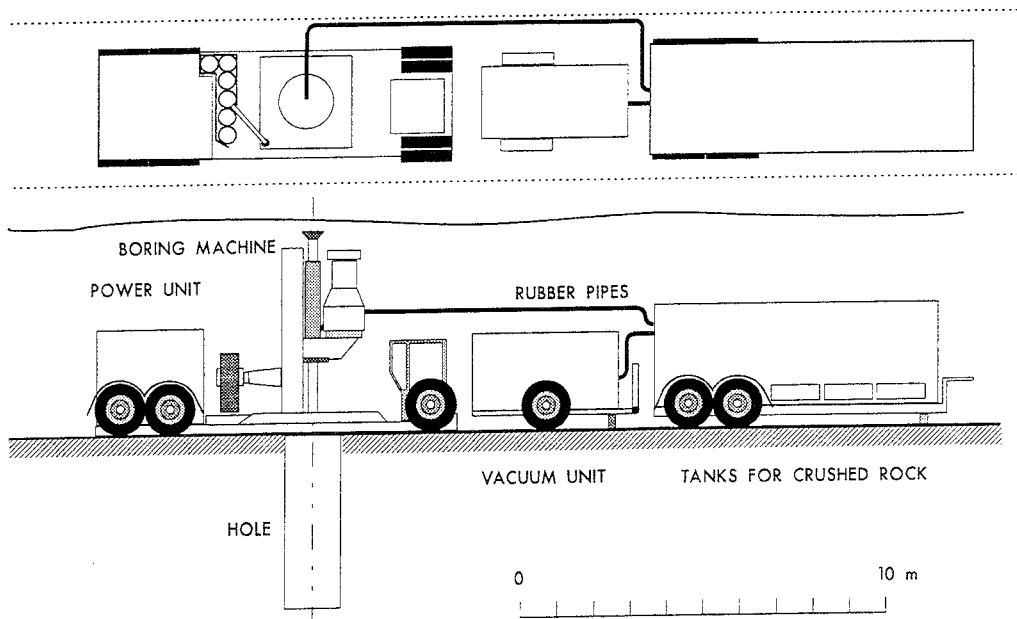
One proposed concept for a deposition hole boring machine.
